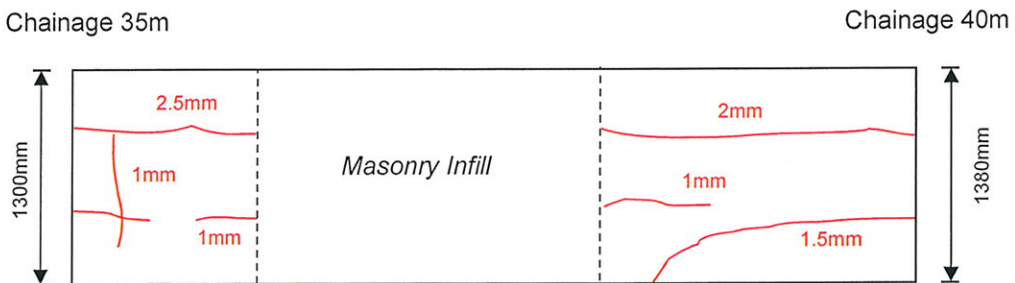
Wall Height, Crack Locations and Sizes for Chainages 35m to 40m
